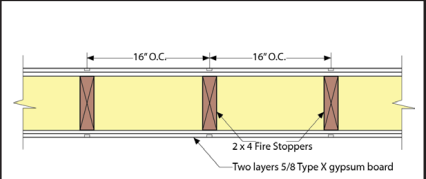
Separation Wall - 2 hour separation wall insulated with low density open cell spray foam with a STC 50 rating using a single 2x4 wall – U301.
